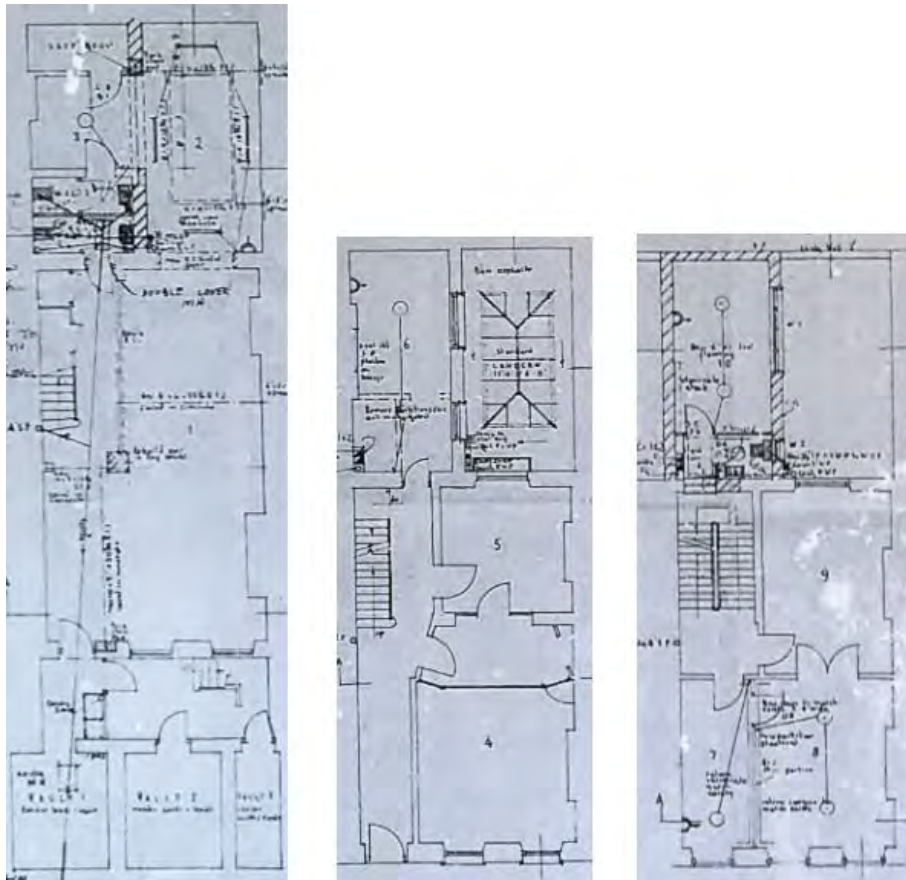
1955 drainage plans (basement, ground floor and first floor)
